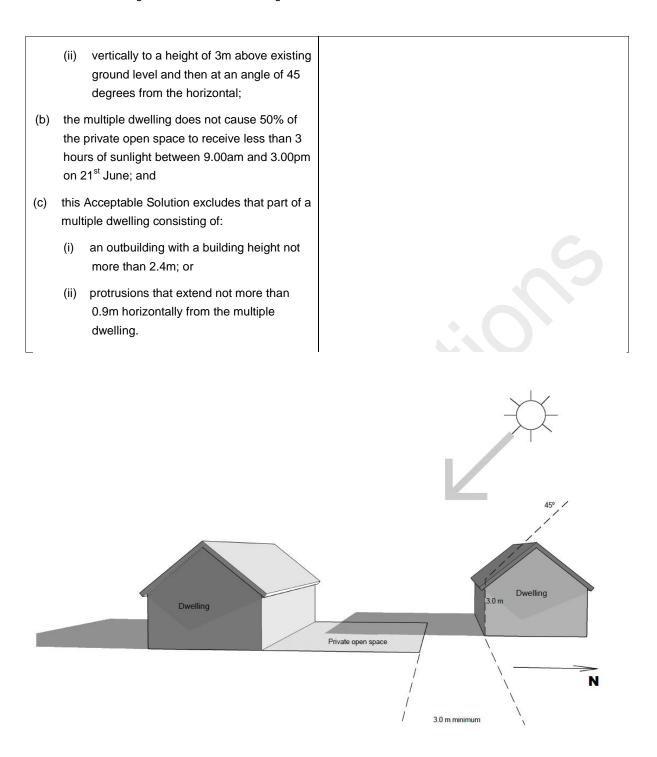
Separation from the private open space of another dwelling on the same site as required by clause 8.4.4 A1(a)
